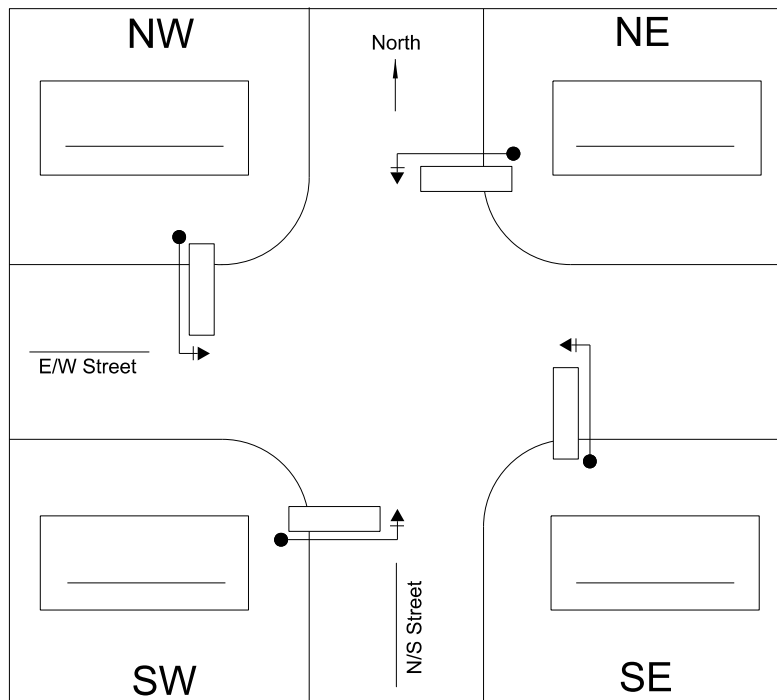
TYPICAL METRO STREET NAME SIGN INSTALLATION
